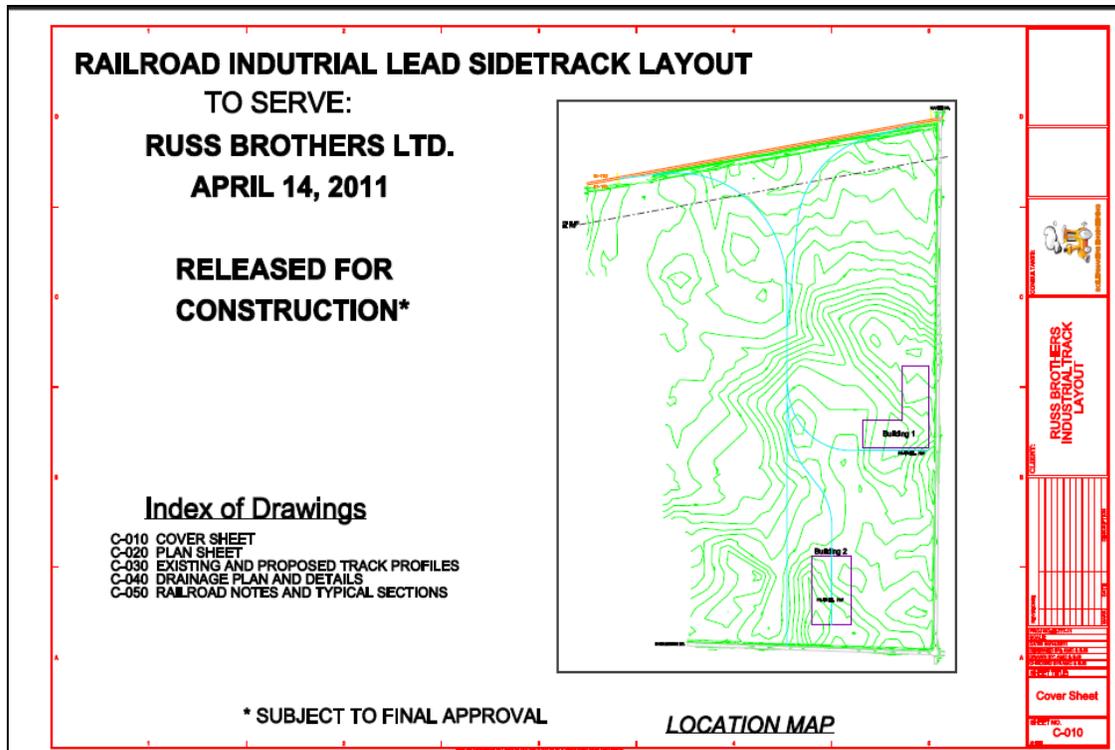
Sample Plan Set Cover Sheet of Railroad Track Design and Engineering Final Project
